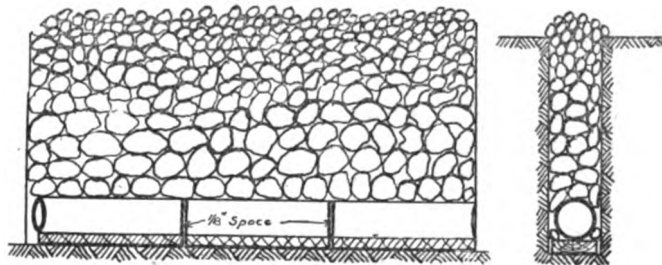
LONGITUDINAL SECTION CROSS SECTION
